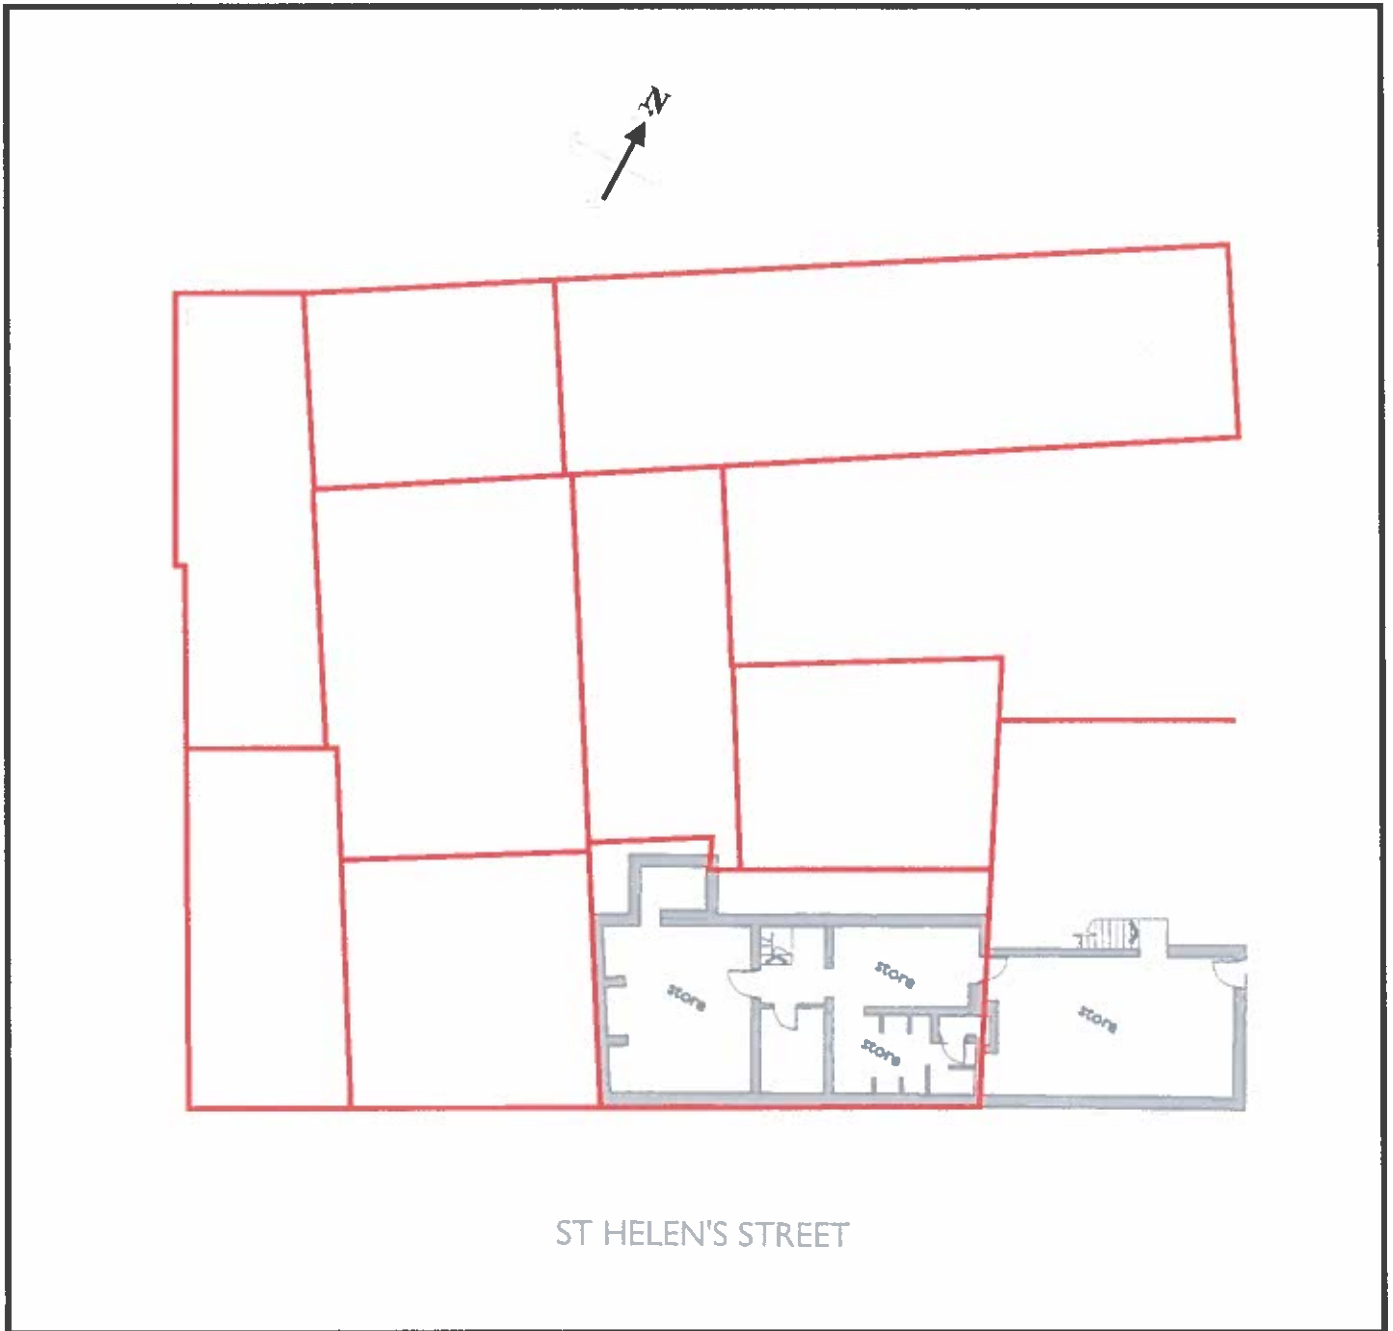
Cellar plan of 10-14 St Helen's Street, Derby, with outline of ground plan shown in red. Scale 1:200. Copy courtesy of Franklin Ellis Architects.
